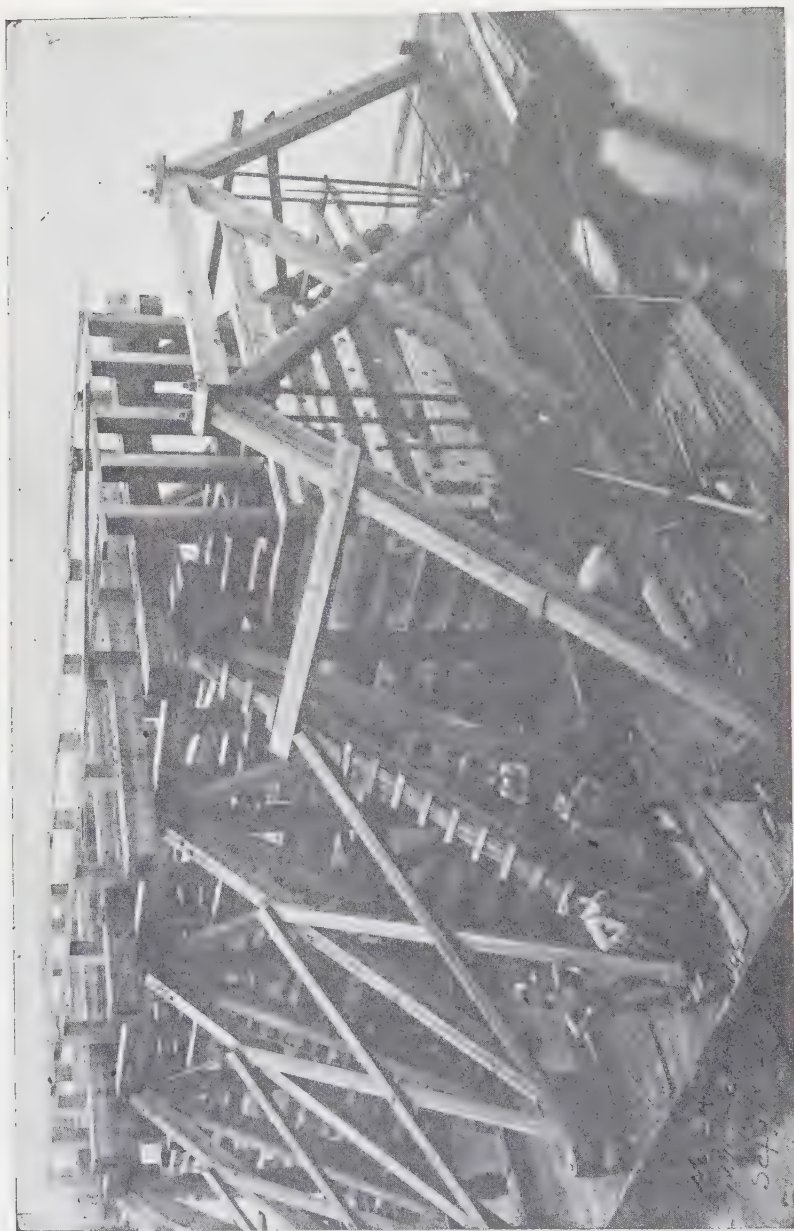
i*.—Barges Supporting Pneumatic Caisson under Construction at Portland, Ore.
